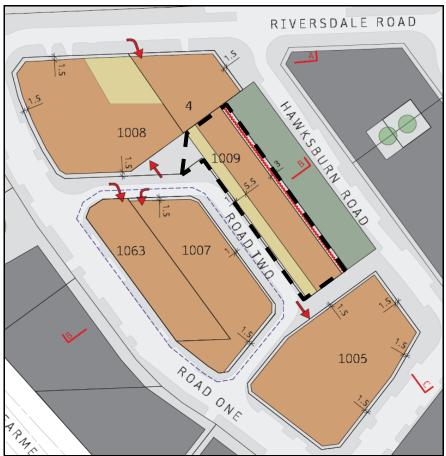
Extract from The Springs Design Guidelines Detailed Area Plan
